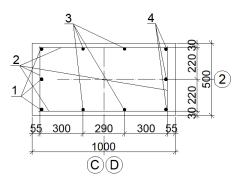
Column reinforcement at the intersection of axes "2"-"C" and "2"-"D": for column "2"-"C": 1, 4 - Ø22 AIII (A400C), 3 - Ø20 AII (A400C); for column "2"-"D": 1, 3, 4 - Ø20 AII (A300C), 2 - Ø8 AI (A240C) spacing of reinforcement is 300 mm
